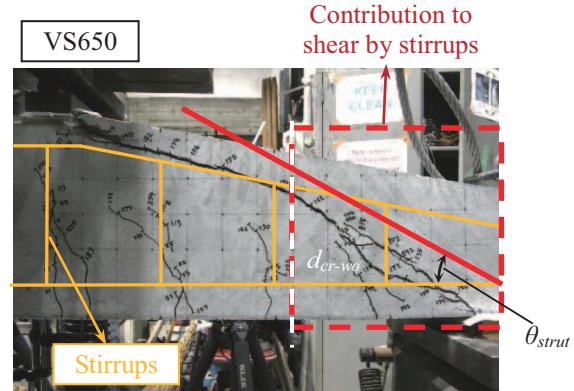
The locations of the main diagonal crack and stirrups
